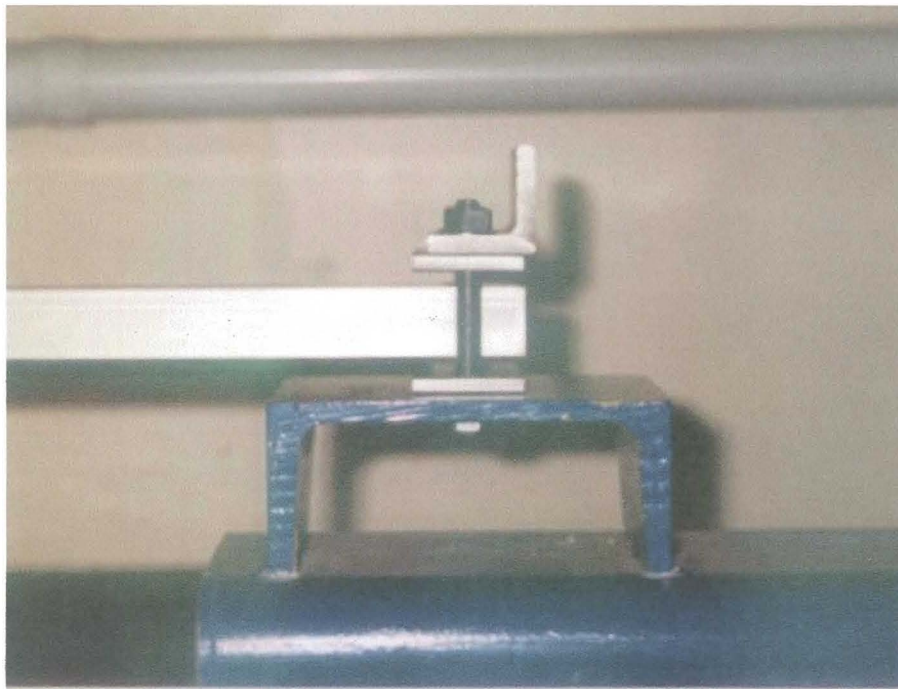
Construction of the support for the hinged-hinged aluminium beam.
